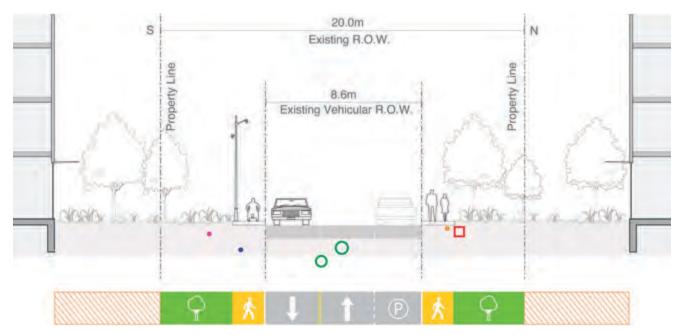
Section of the Existing Conditions of Broadway Avenue between Yonge Street and Redpath Avenue
